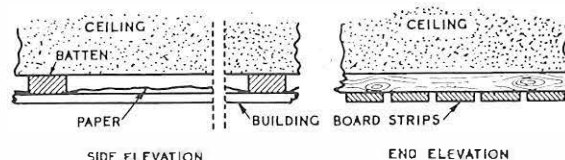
CONSTRUCTION OF STRIP BUILDING BOARD TREATMENT.
